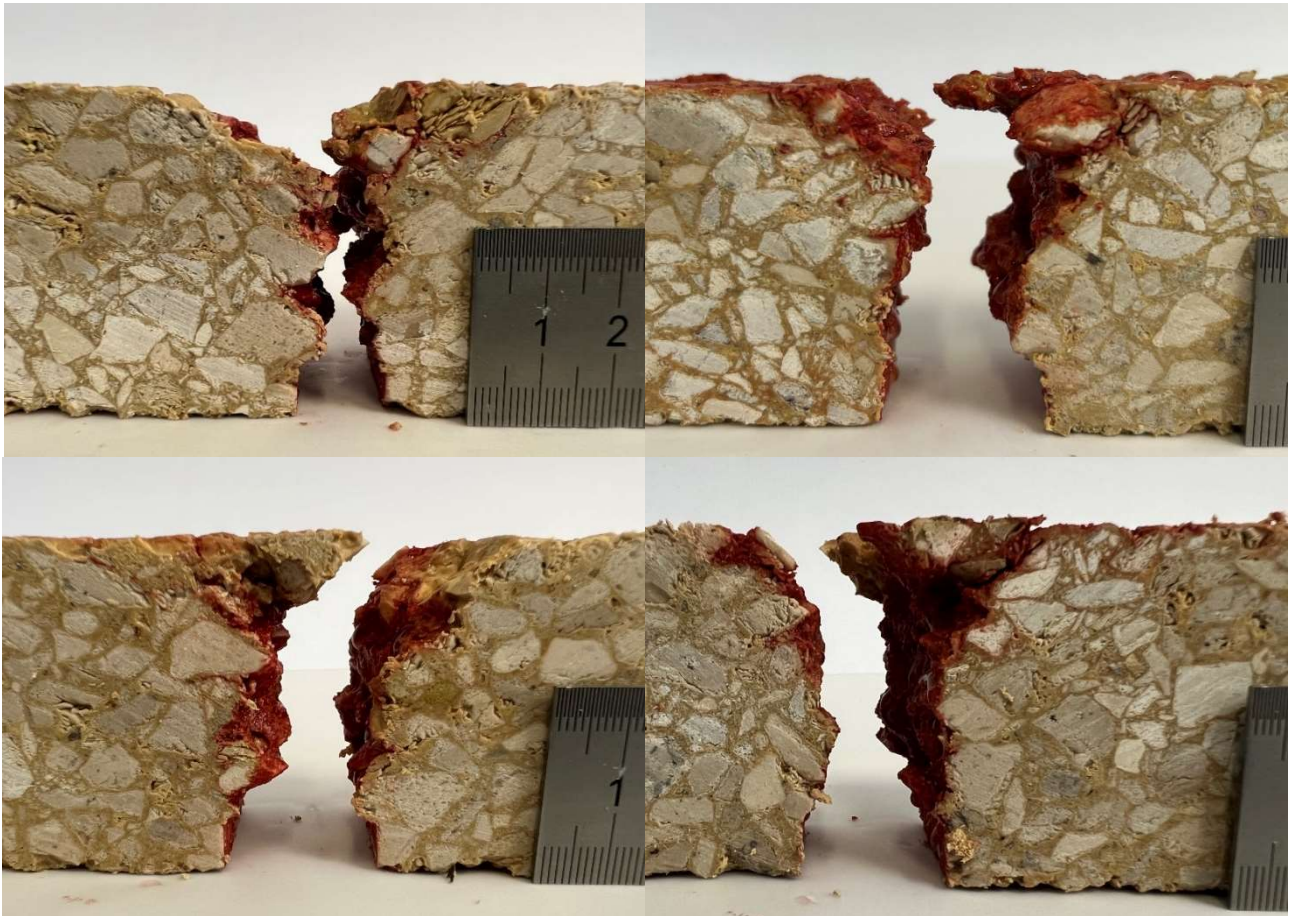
Photographs of the cracking in the SMA High Damage Level beam
